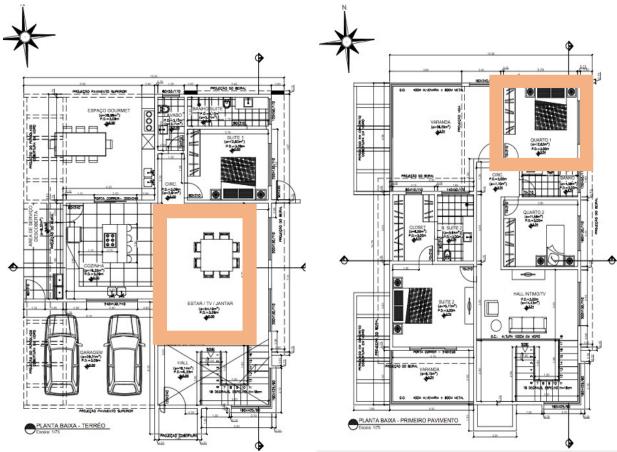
Floor plan of the first floor in the studied model. Source: own author.
